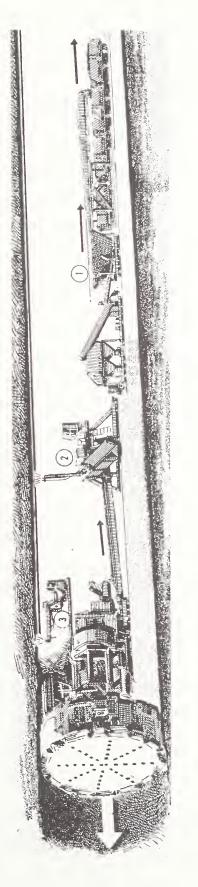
SHOTCRETE LINING BEHIND A TBM
